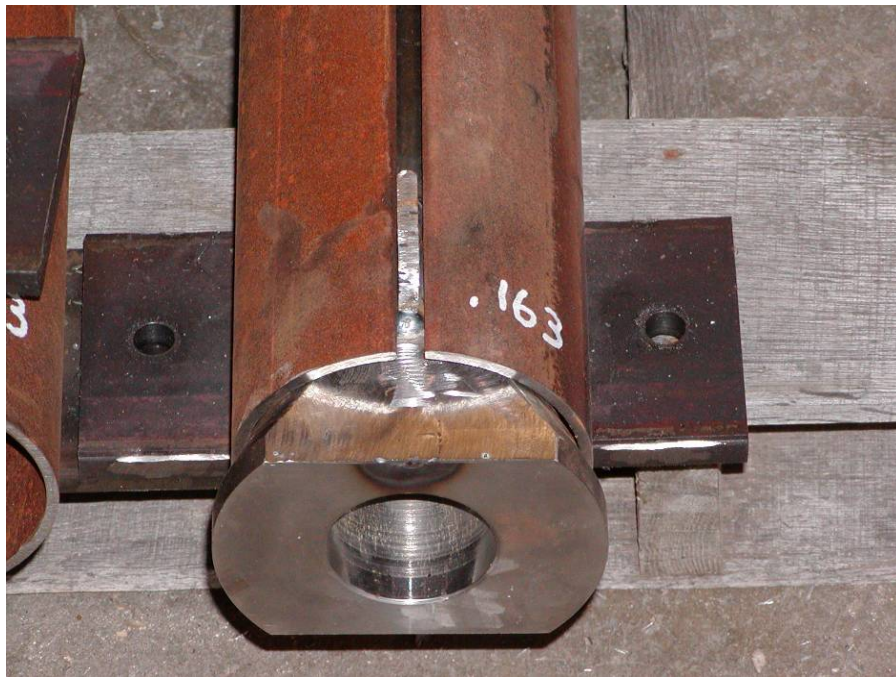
Expanding Tube Mandrel Placed Inside 4-inch Pipe
